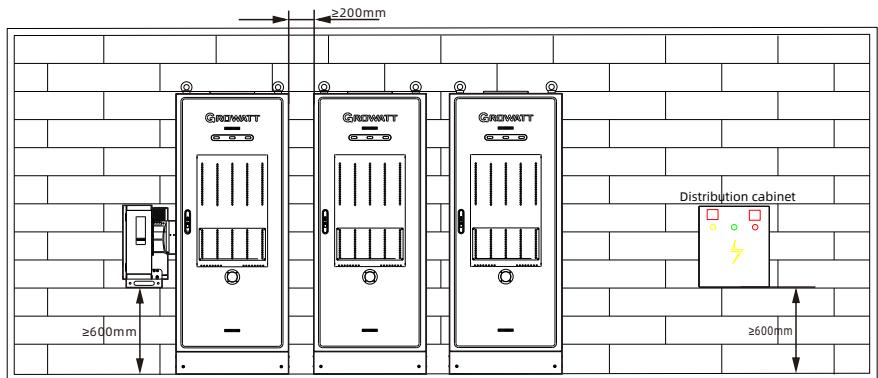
Front View of the Outdoor Cabinet System Layout
